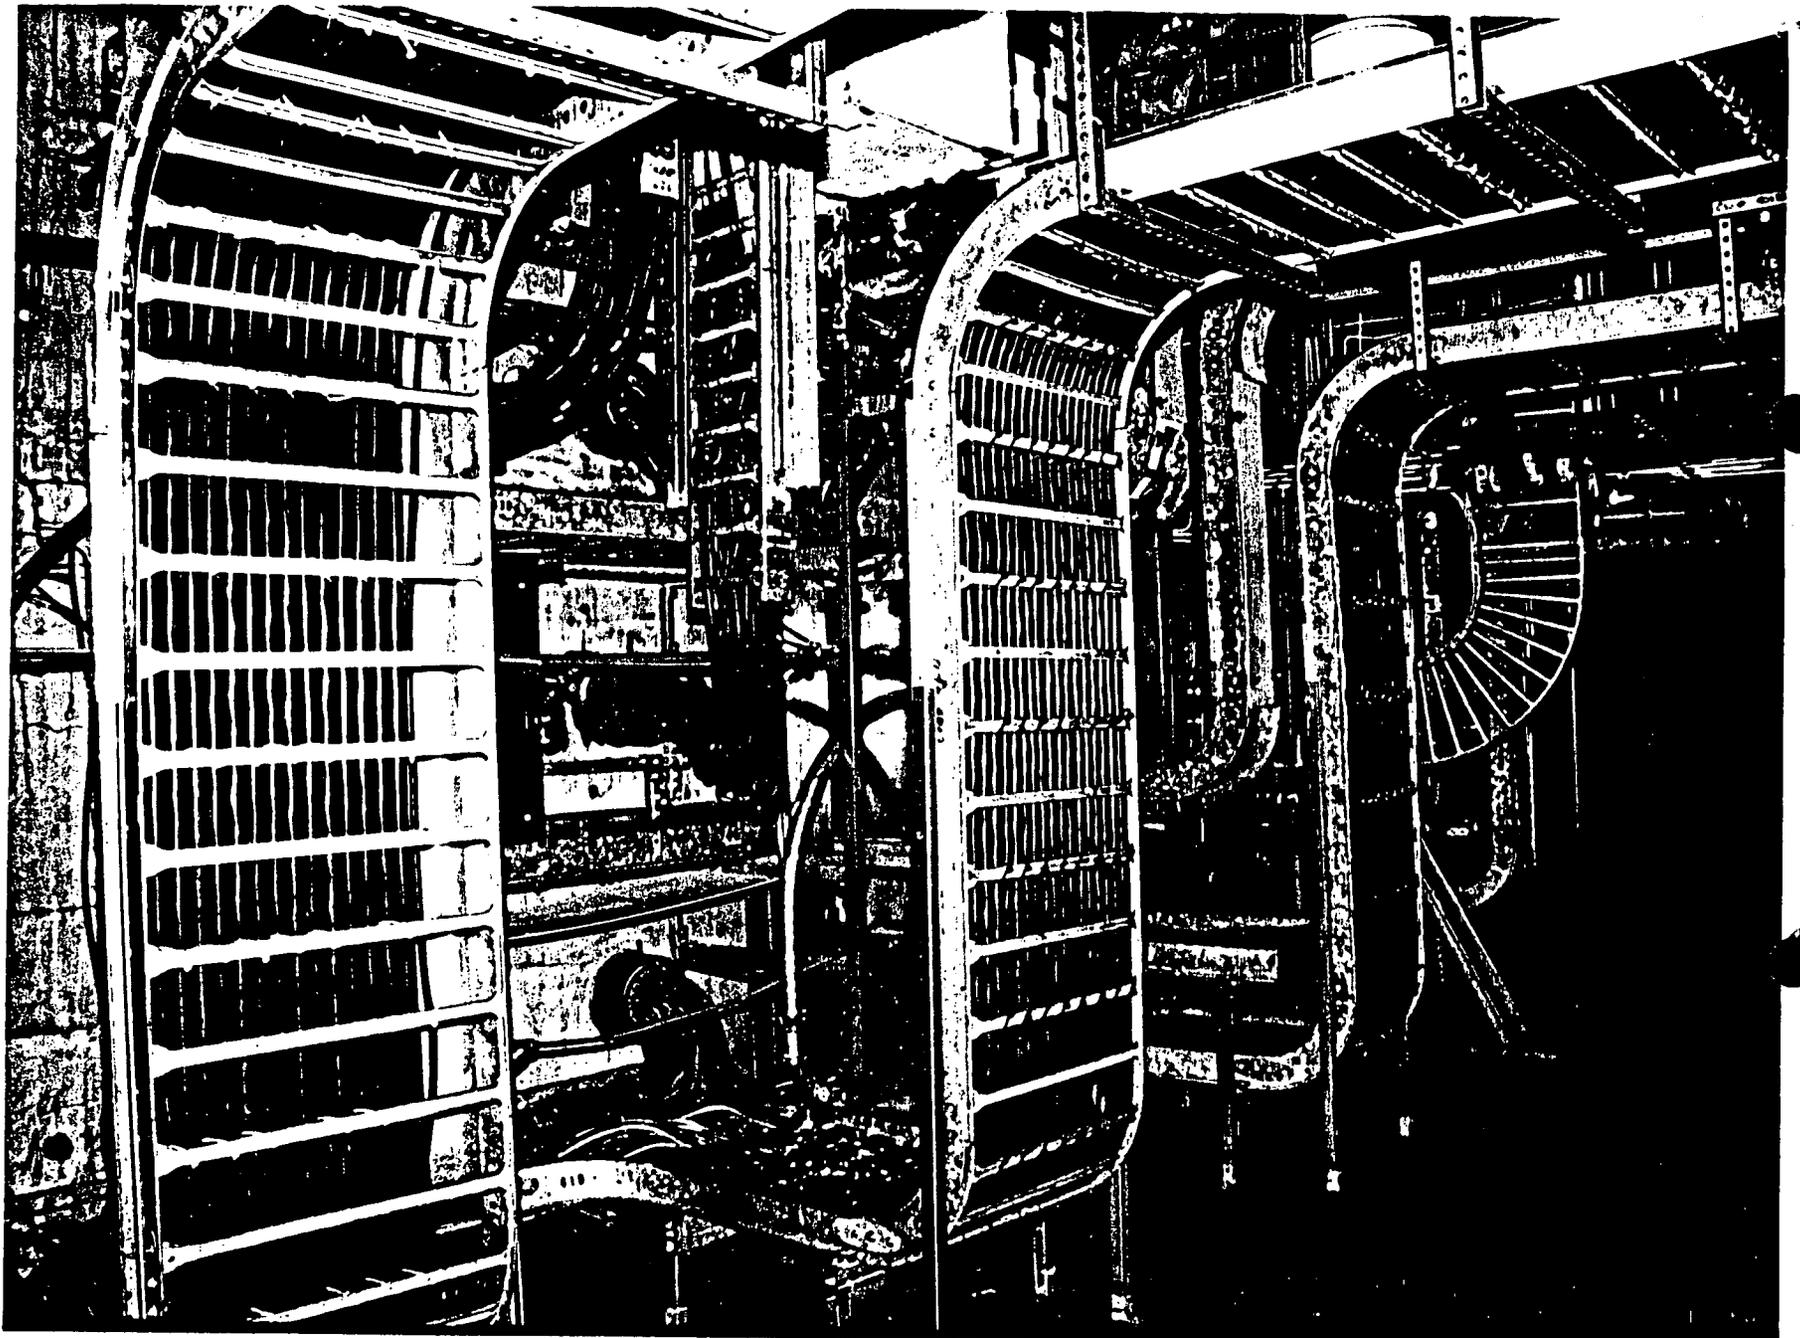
Penetrations on Inner Wall with Trays Crossing to Outer Wall
